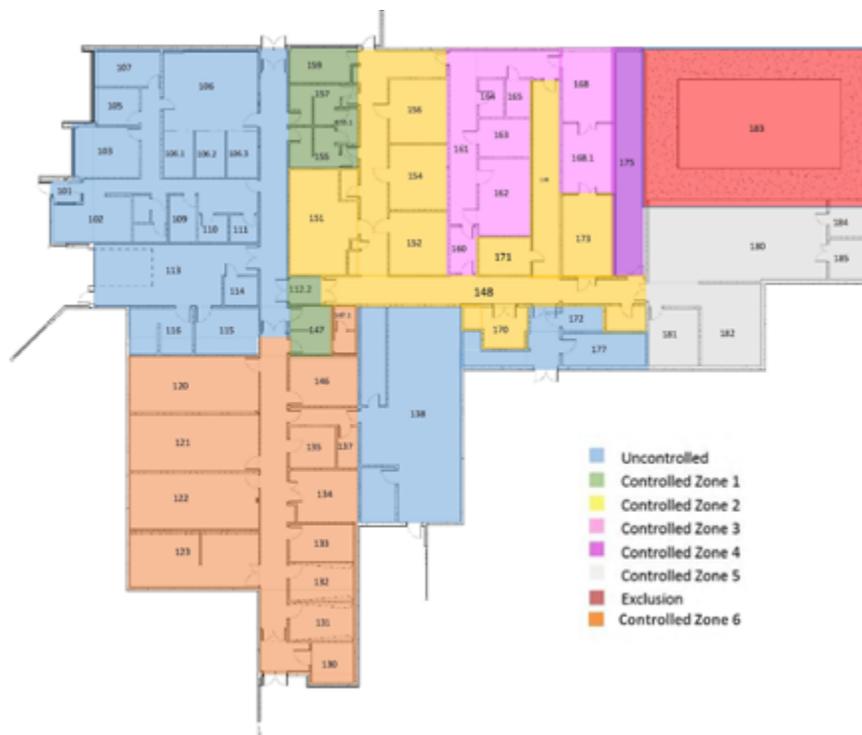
Cyclotron Facility floorplan showing the Innovation Wing as Controlled Zone 6.
